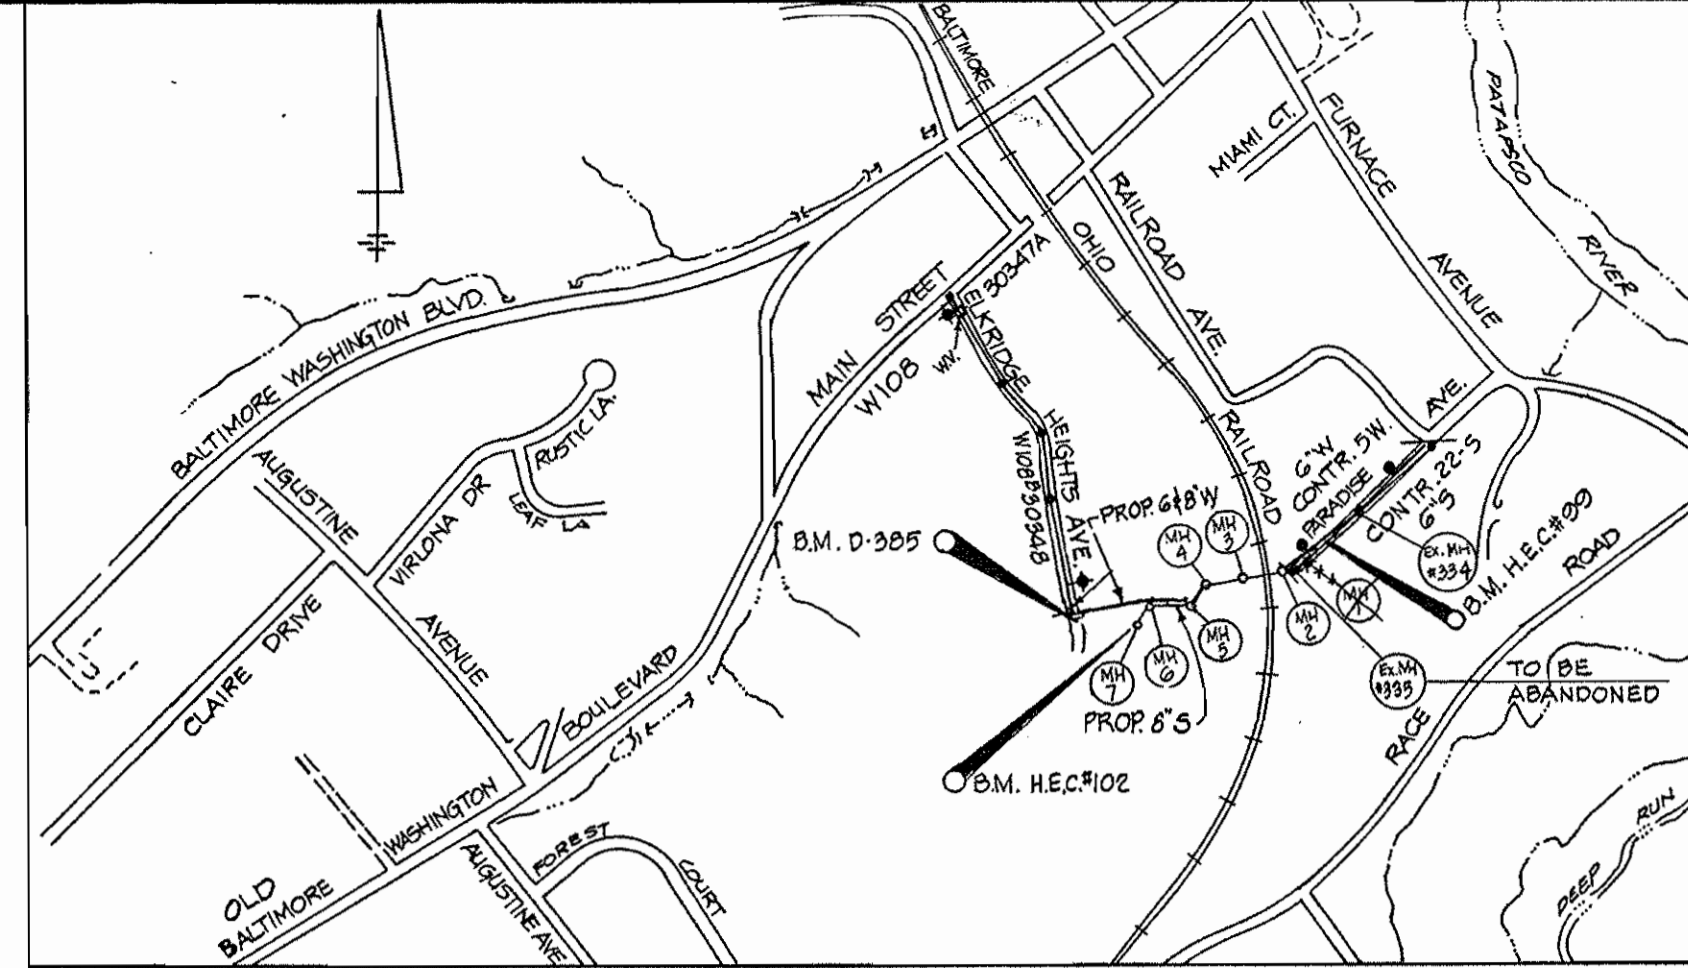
DETAIL FOR BORING & JACKING AT BALTO. & OHIO R.R. CROSSING
